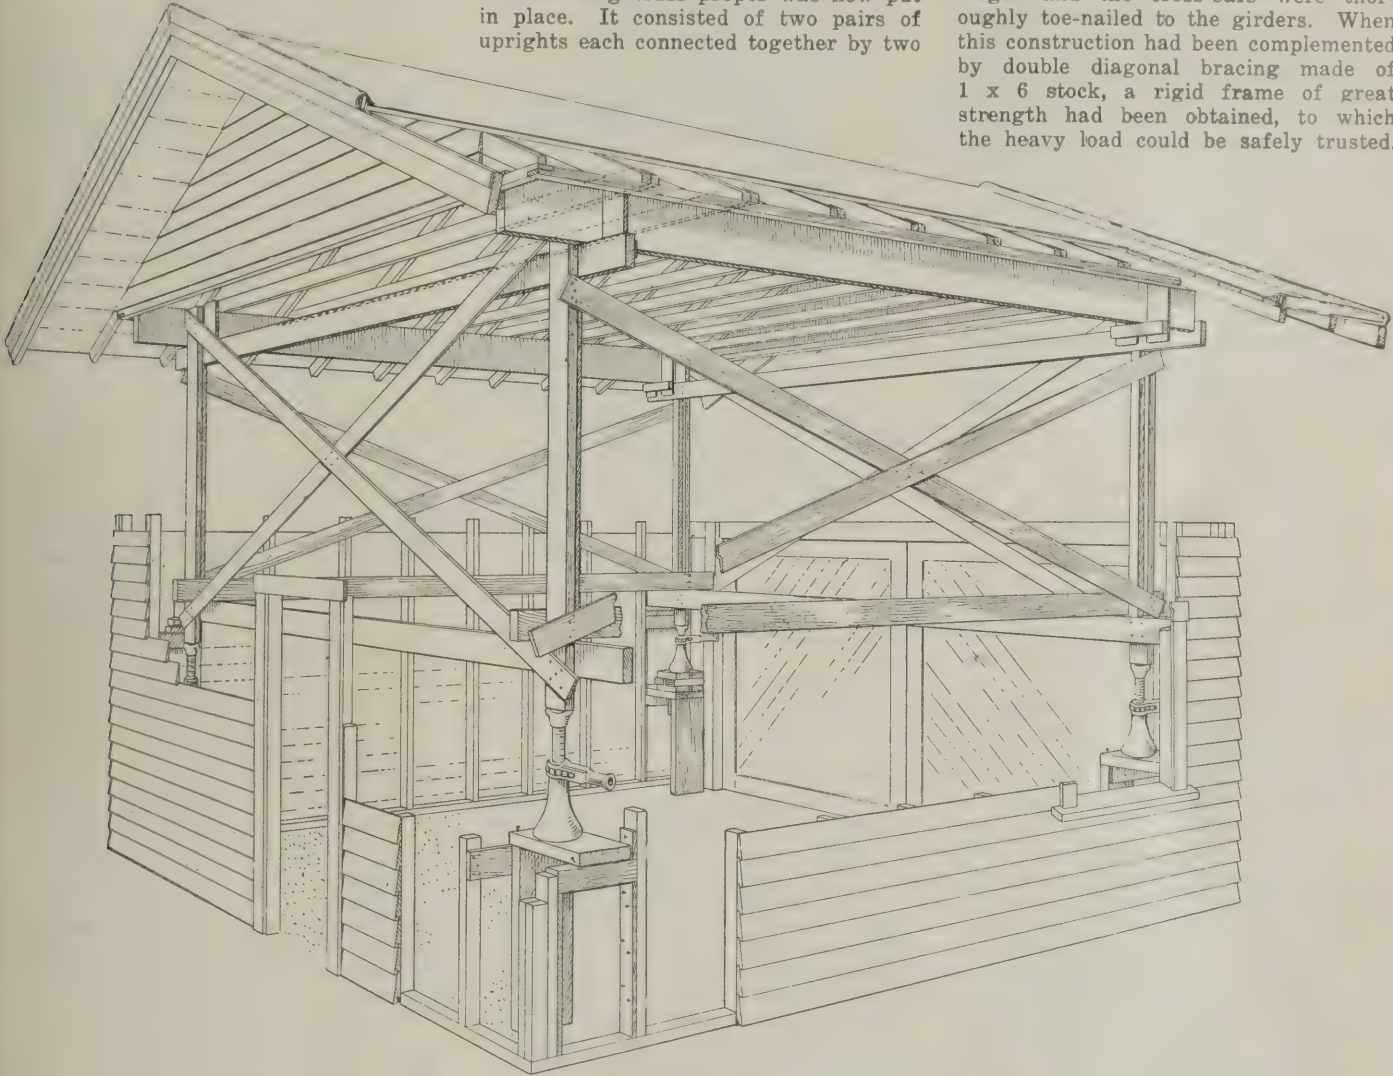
ILLUSTRATING METHOD BY WHICH ROOF WAS JACKED UP
